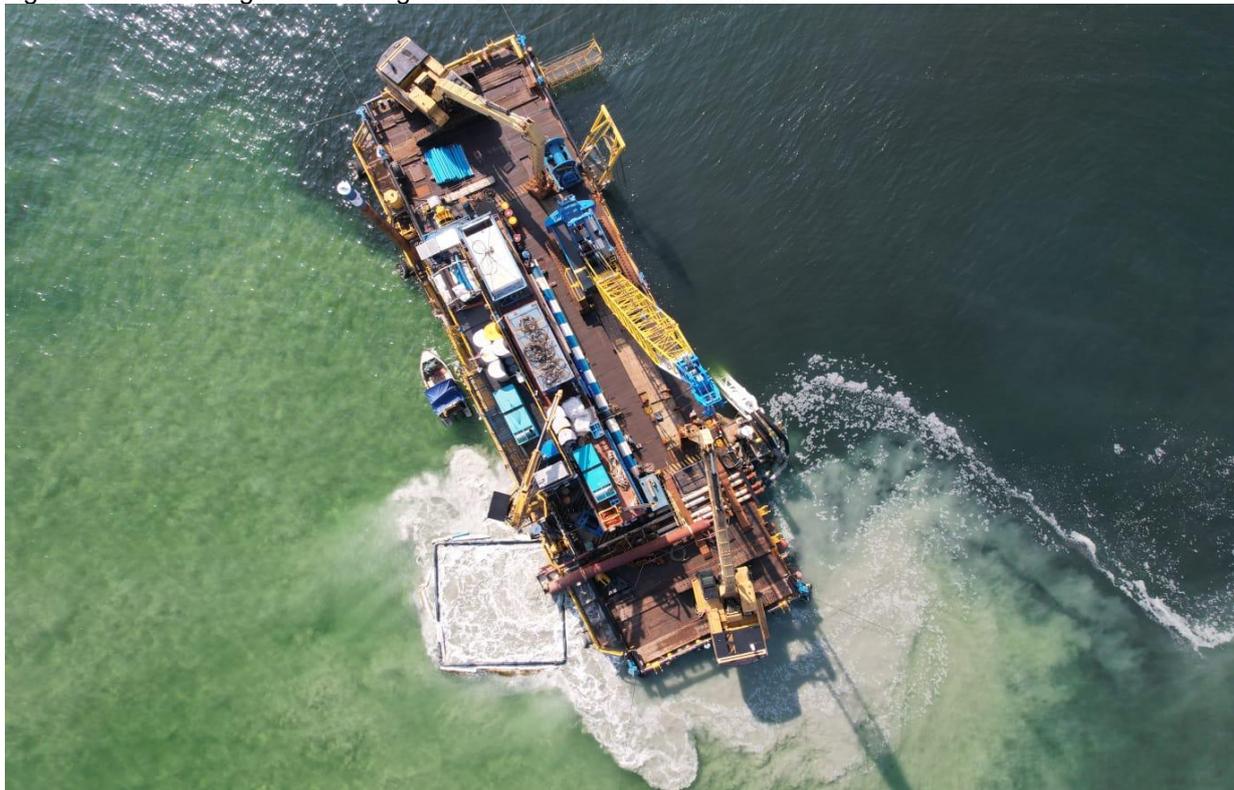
Pre-Trenching with Trailing Arm in Sriracha Project (can be adopted for post trench) – Aerial view
